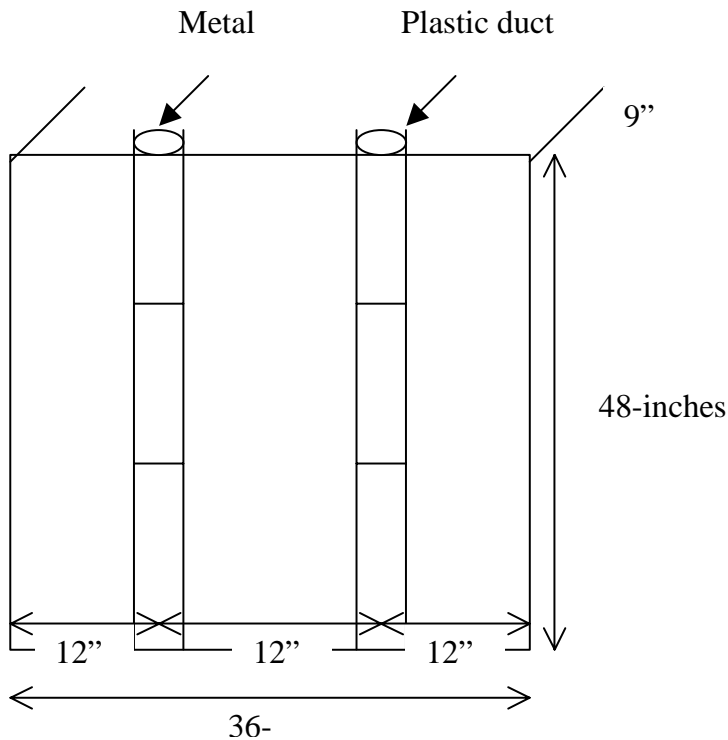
Reinforced Concrete Dimensions and Duct Locations
